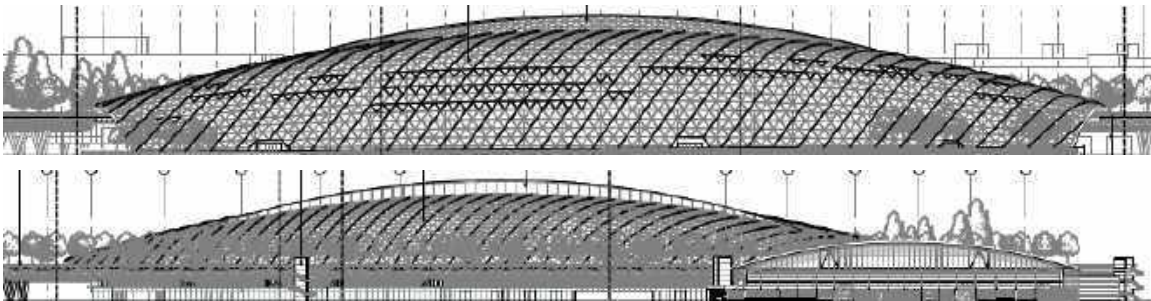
Conceptual drawings of the north façade (top) and south façade (bottom) of the atrium. Trees to be planted along the north façade are not shown.
